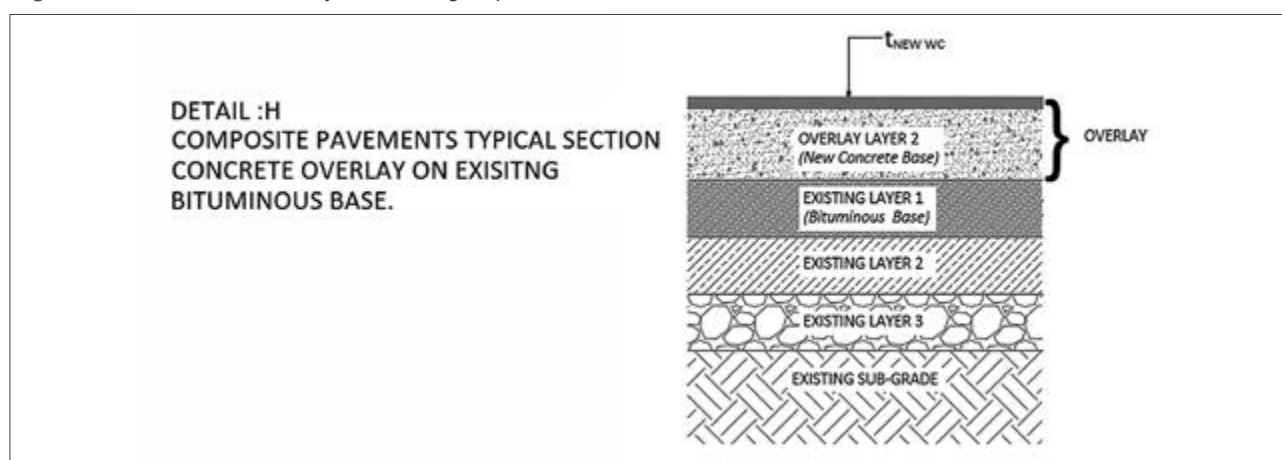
Concrete Overlay on Existing Asphalt Pavement
